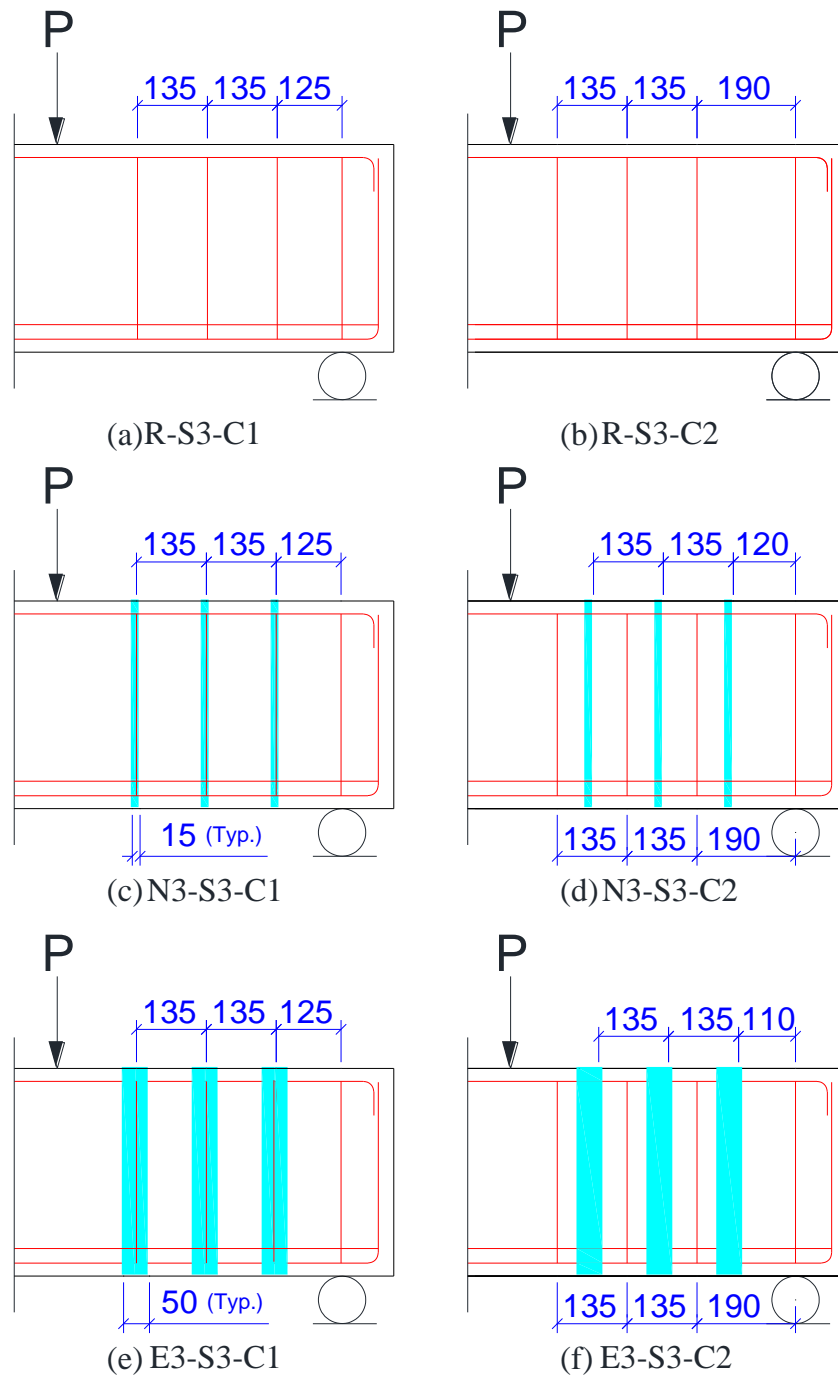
Group 3- Beam specimens with three stirrups at the CSS (Dimensions in mm).
